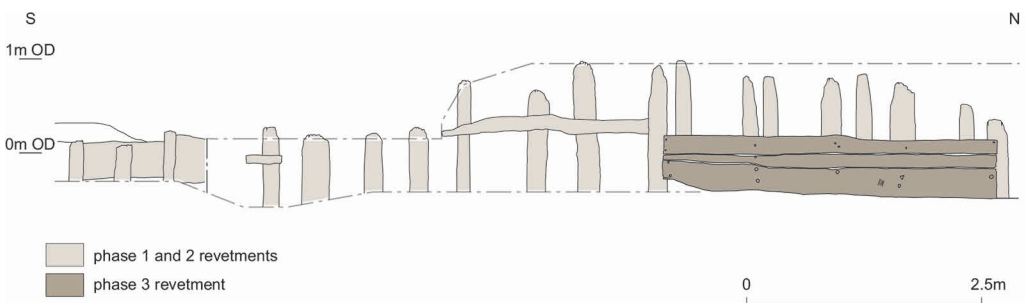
More London site, Southwark. East-facing elevation of the Roman revetment (Structure 2) (scale 1:80).
